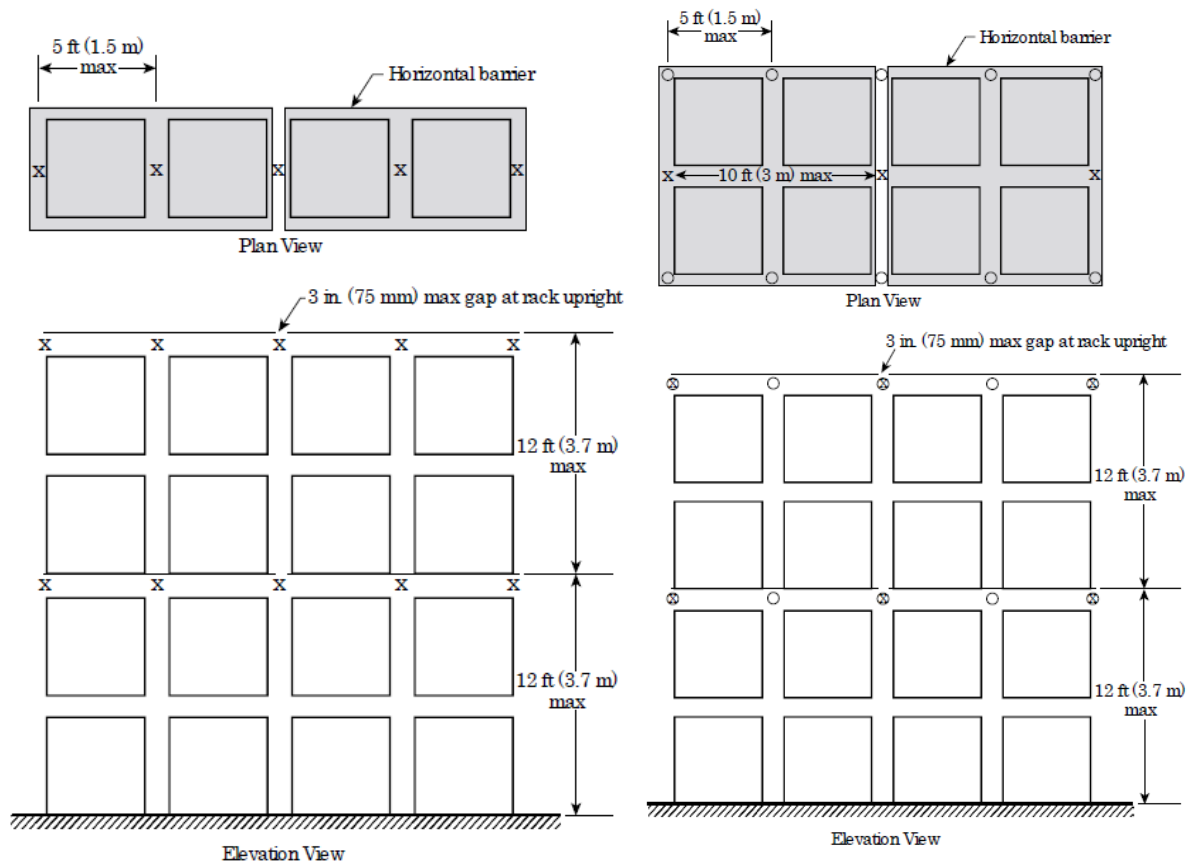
(A) Alternative Protection for Single-Row Racks.
